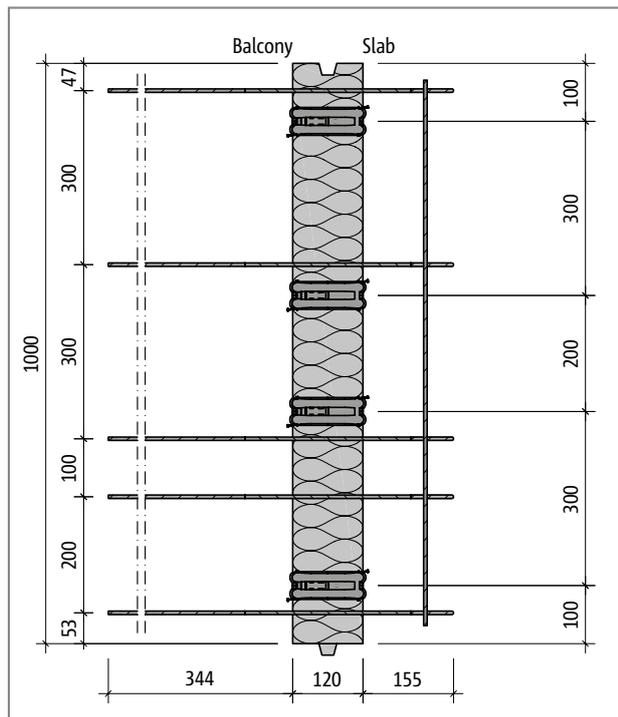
Schöck Isokorb® XT type Q-V1: Product plan view
